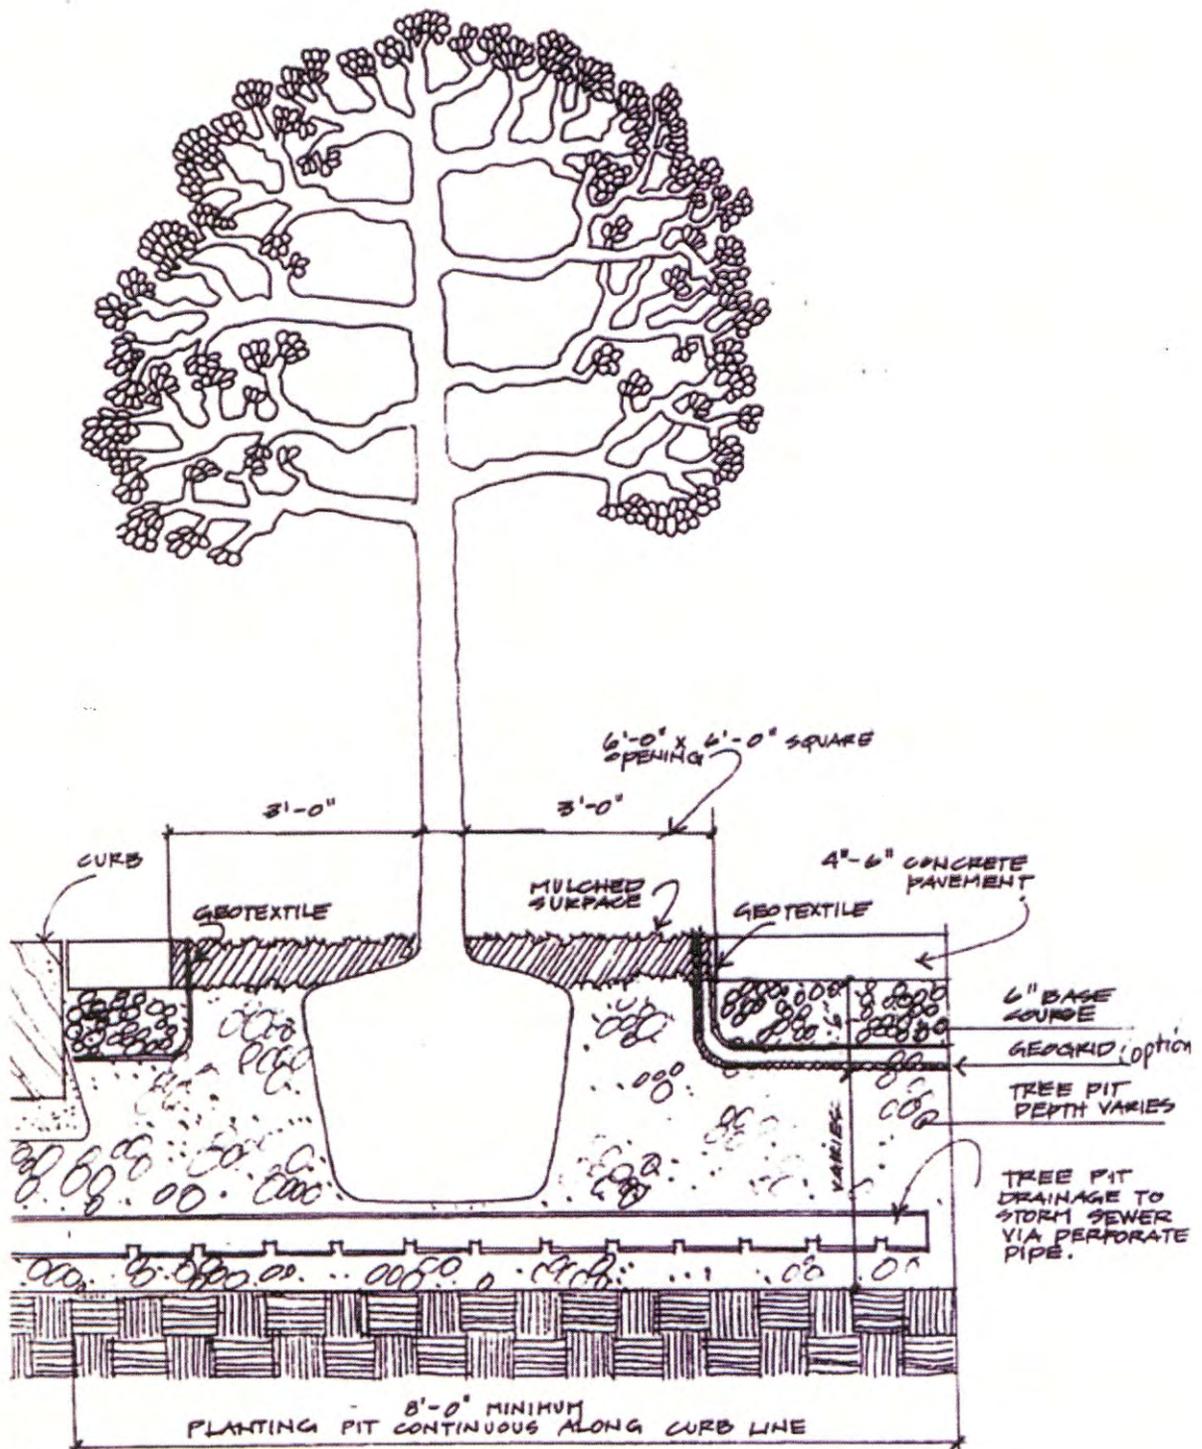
Elevation plan of a proposed structural soil pavement profile using the sub-base as the rooting zone.
